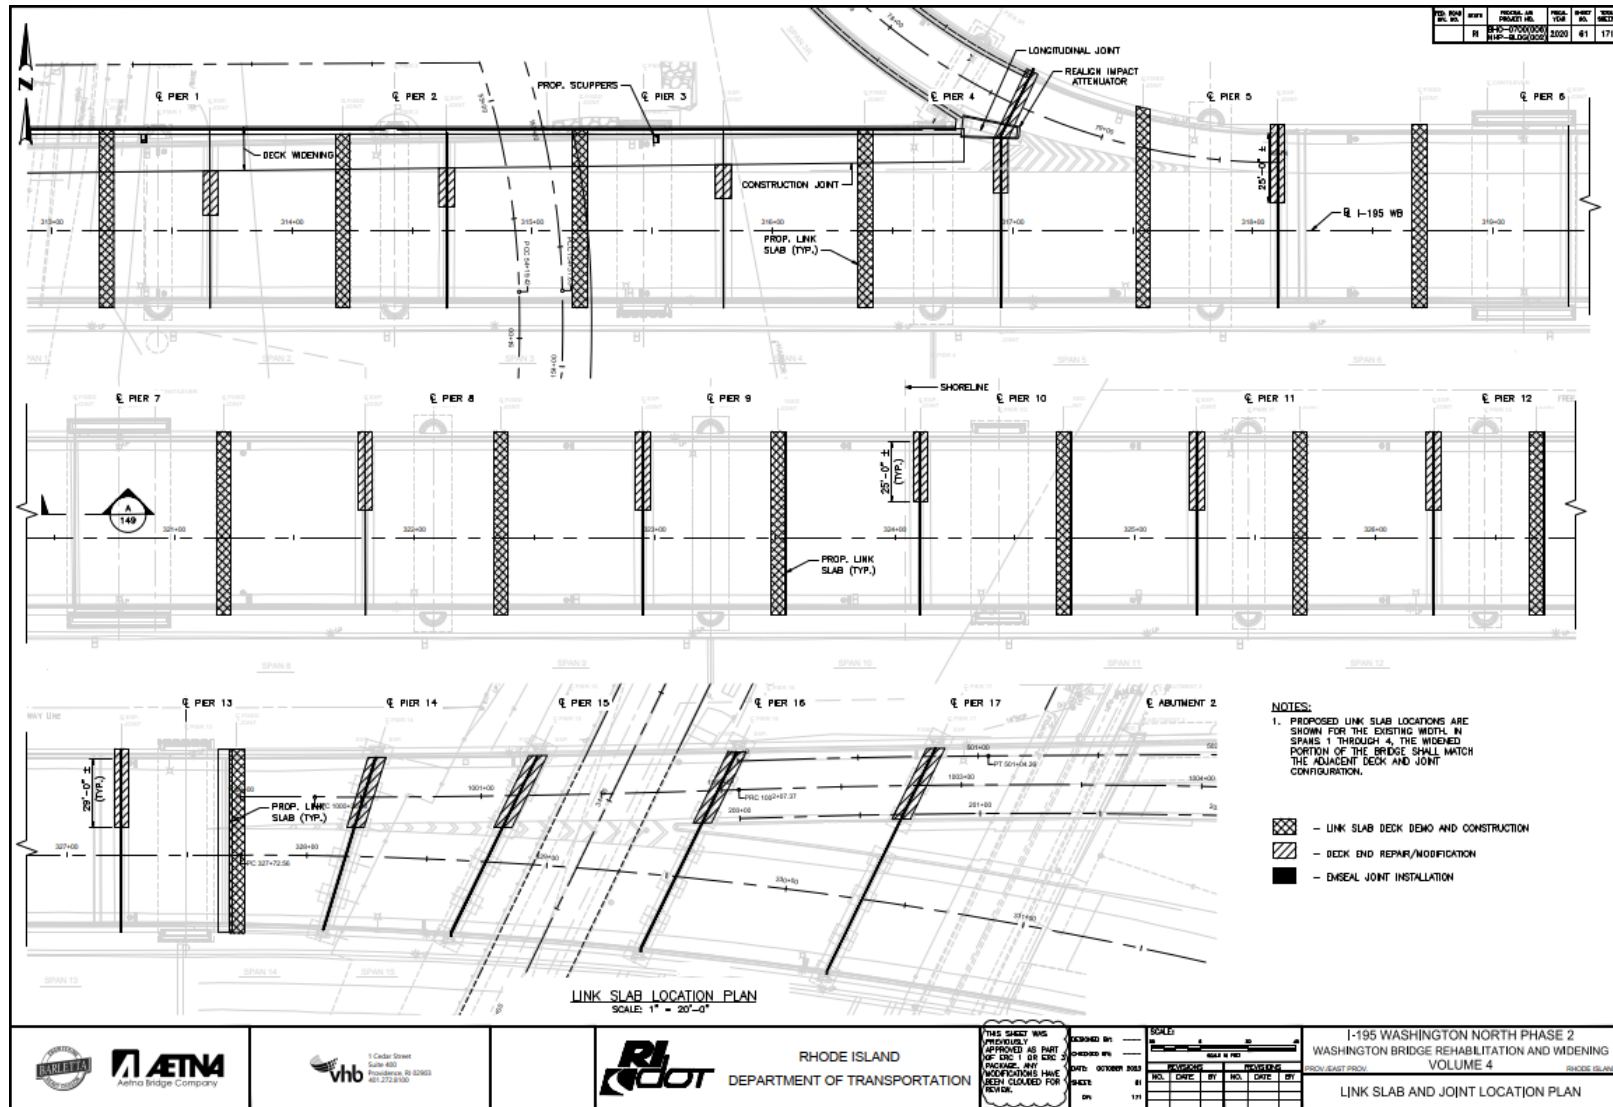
Link Slab and Joint Location Plan for Contract 2021-DB-020 (Sheet 61 of IFC Submission, I-195 Washington North Phase 2 Rehabilitation, Volume 4).
